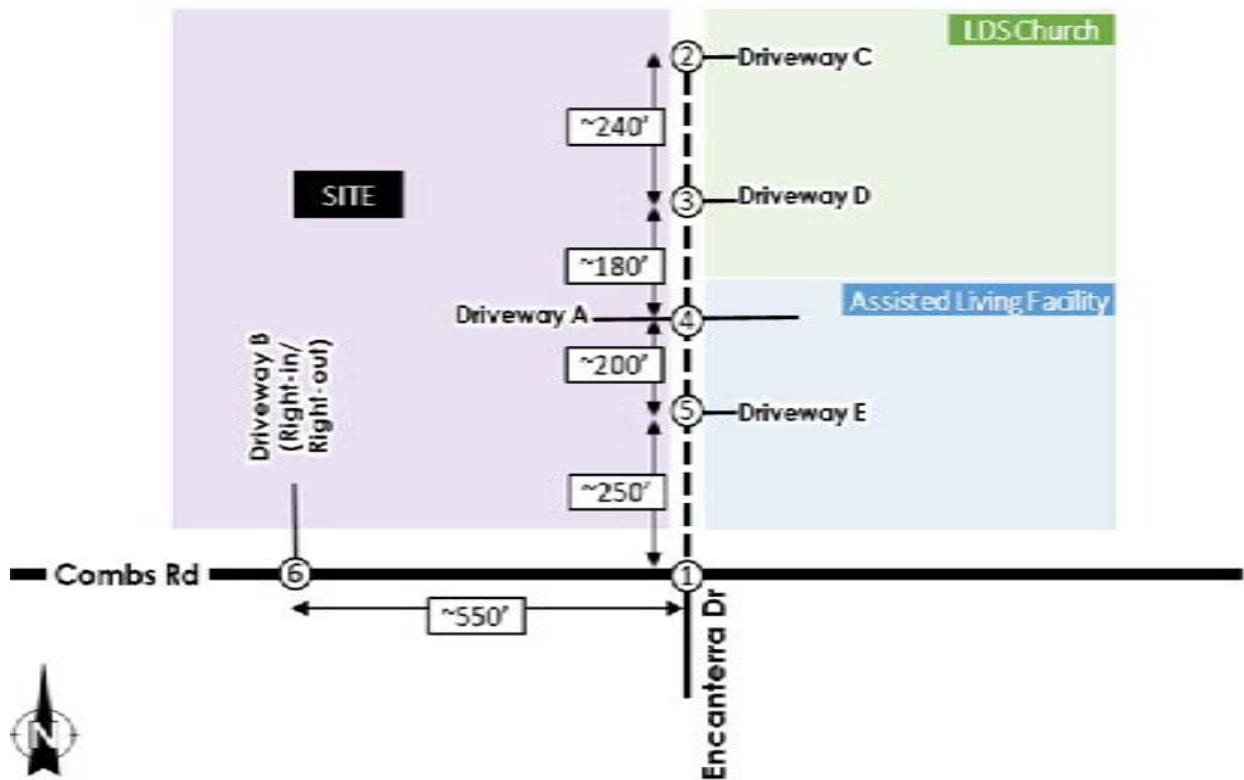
Access Spacing Proposed on Combs Road and Encanterra Drive
